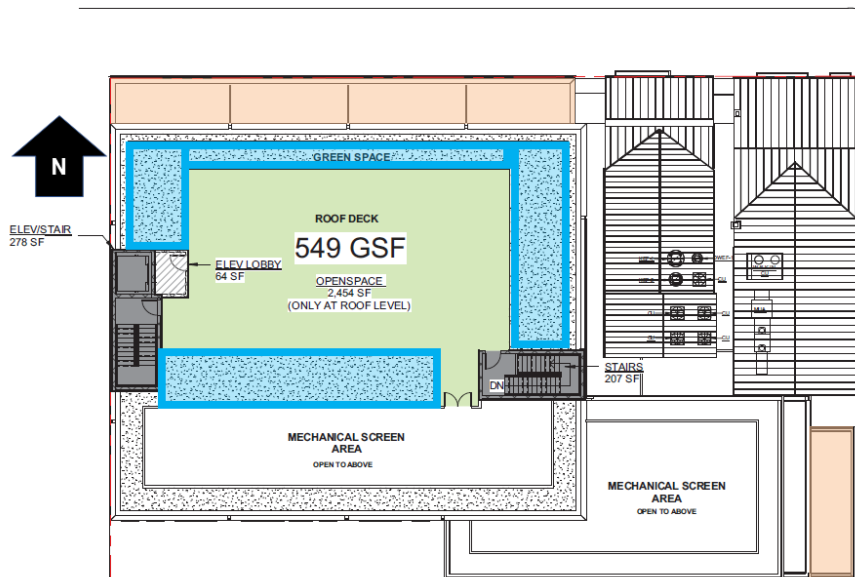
Areas in blue show areas of green roof adjacent to rooftop (common) open space. The lower-level private terraces are in orange.
